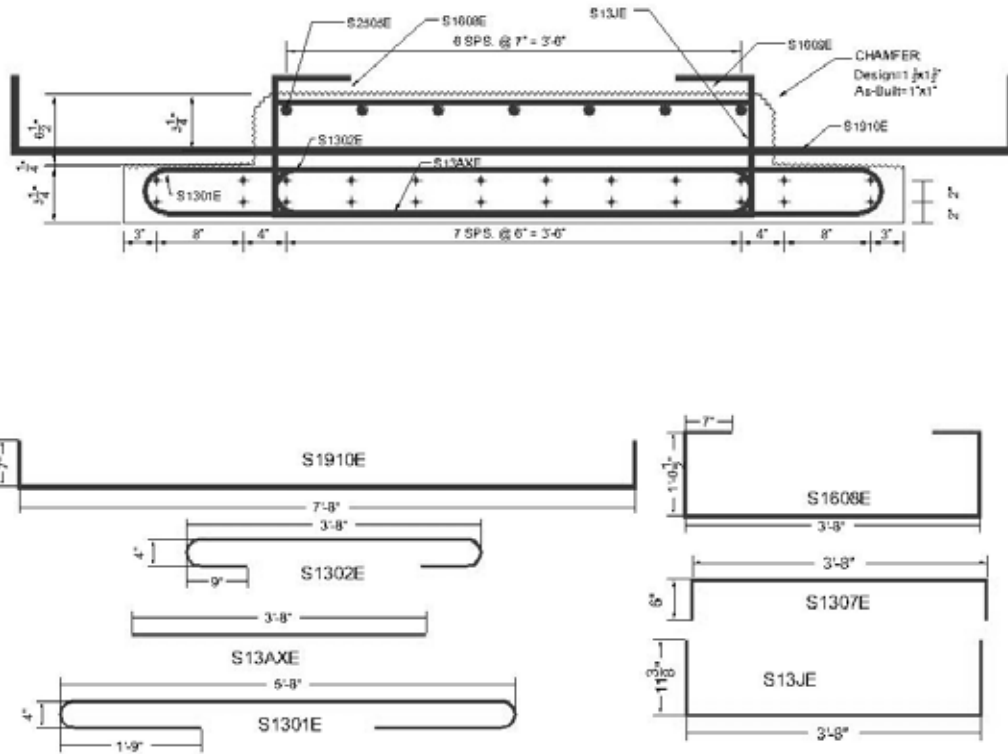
As-built cross section and reinforcement details for the east end of Beam 2N
